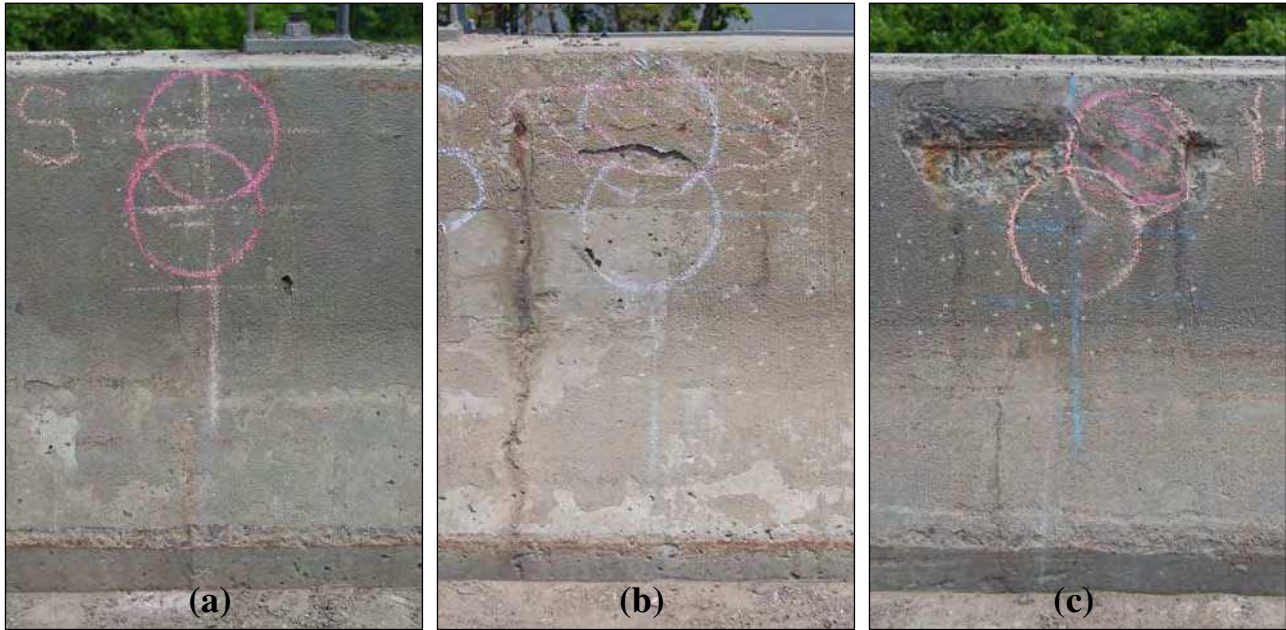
View of barrier wall surface showing three typical levels of damage:
